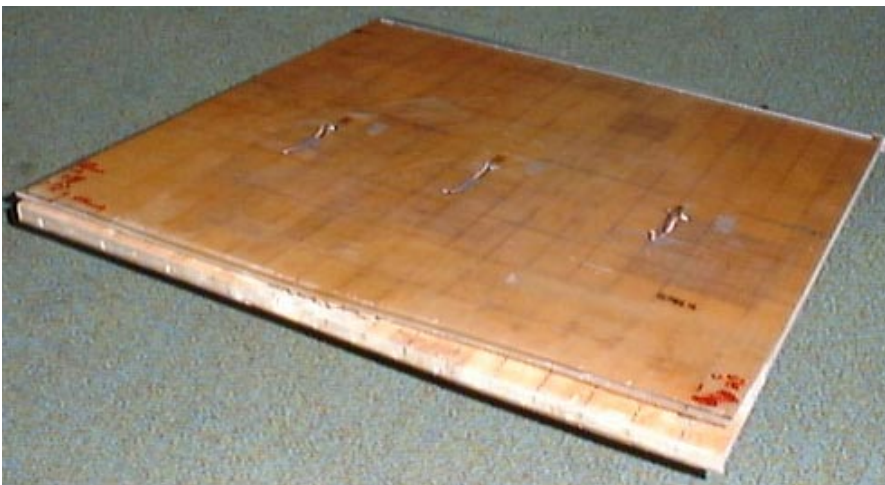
failure of panel B4 which which failed in the single piece fixture, in the SFSF condition
